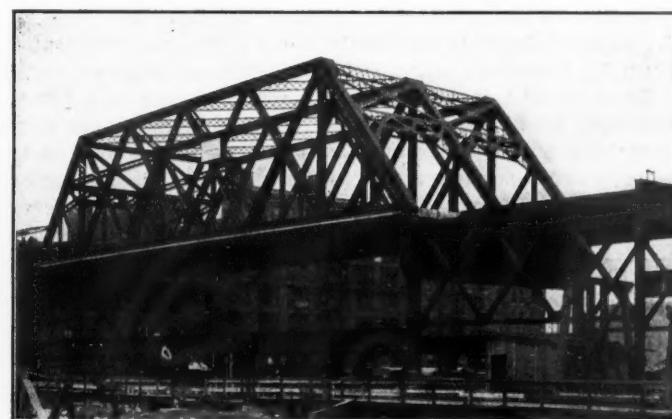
Completed Span; Bridge for Steam Railway Tracks Below.
